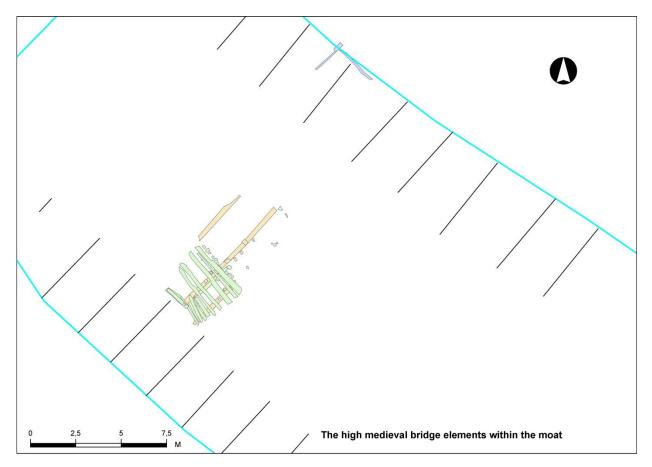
Plan of bridge elements, from c. A.D. 1372 (yellow and lilac) and later additions (green)
